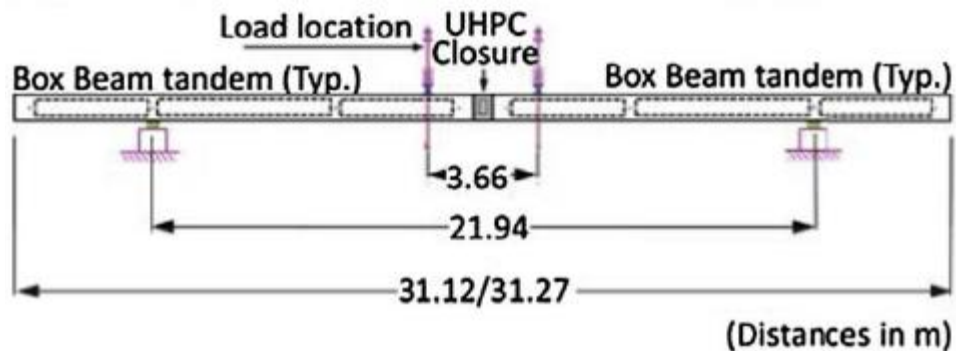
FHWA box beam splice test loading configuration (Maya and Graybeal 2017)
